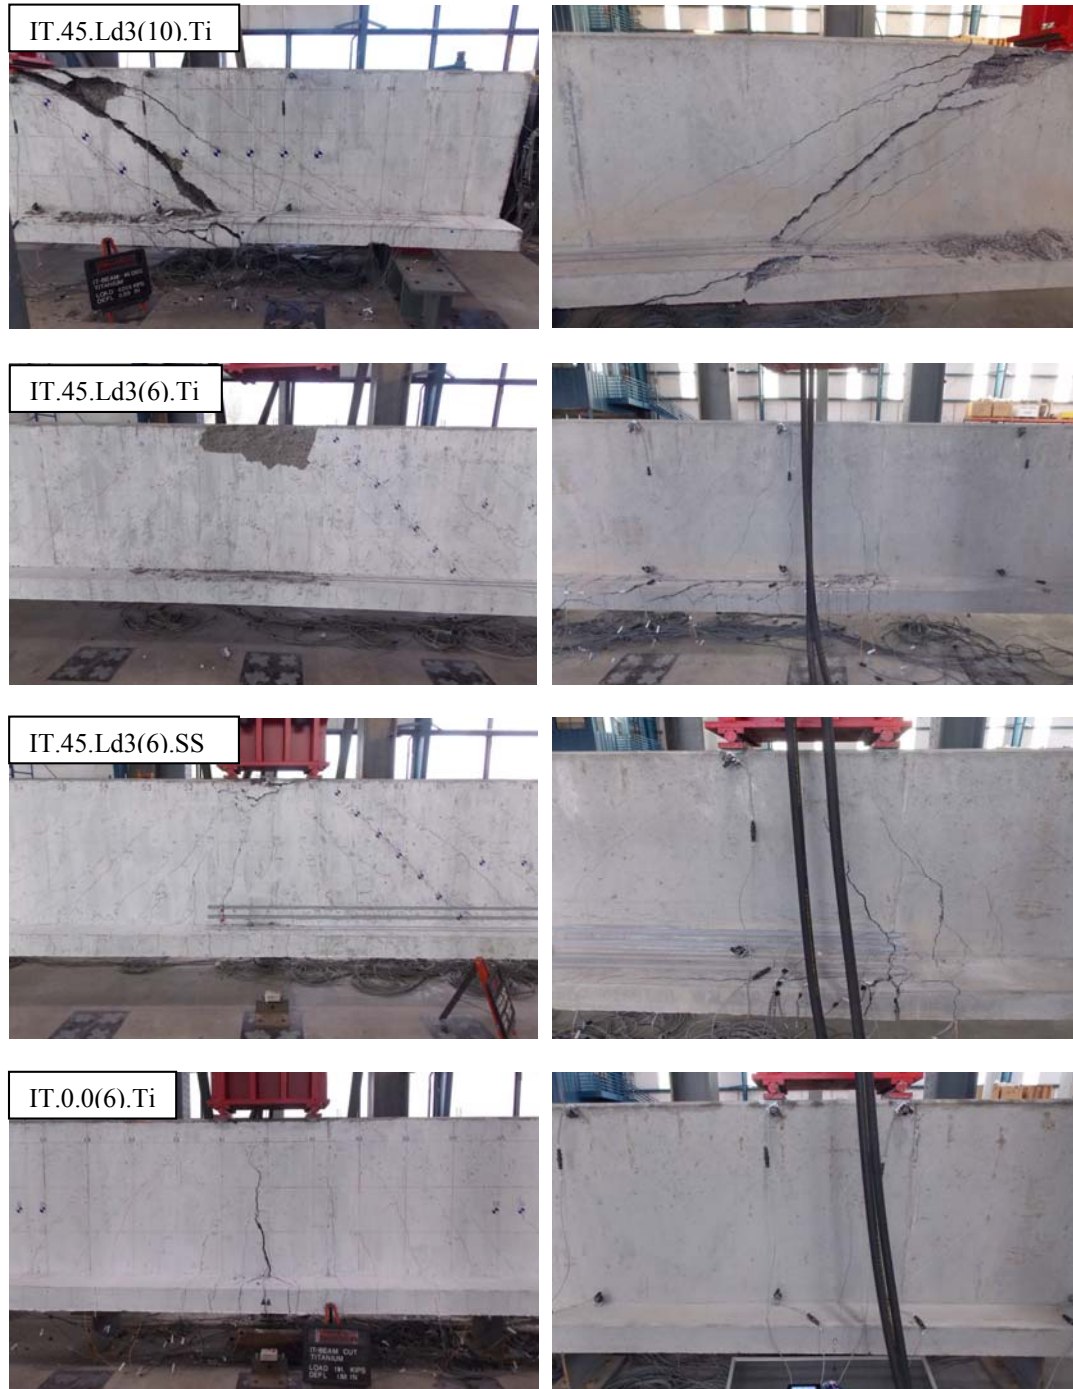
Failure photographs of test specimens (front and back sides)
